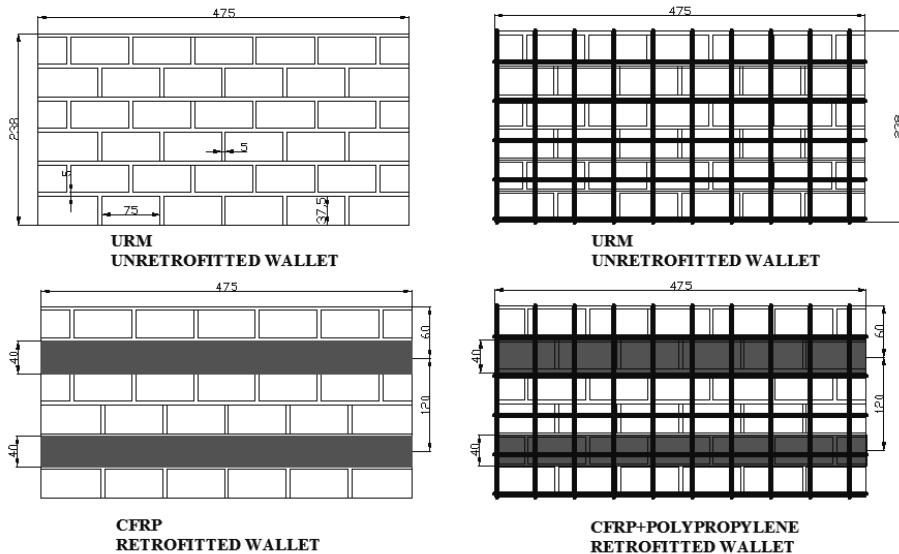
Masonry wallets retrofitting scheme for out of plane load test.
